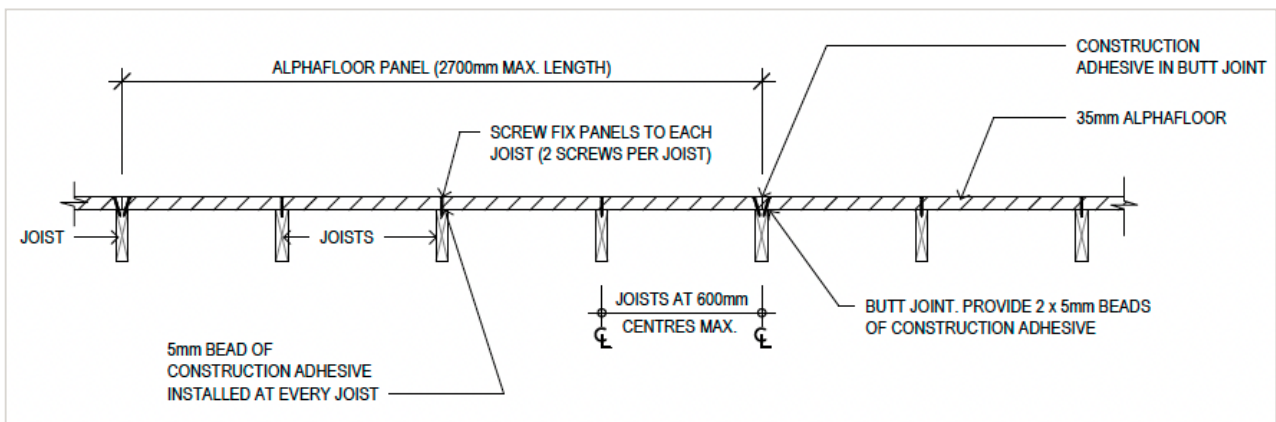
FLOOR SECTION - PERPENDICULAR TO JOISTS
